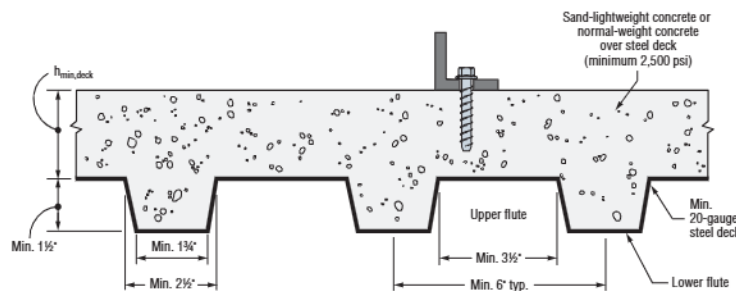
Installation of ¼"- and ⅜"-Diameter Anchors in the Topside of Concrete over Metal Deck
